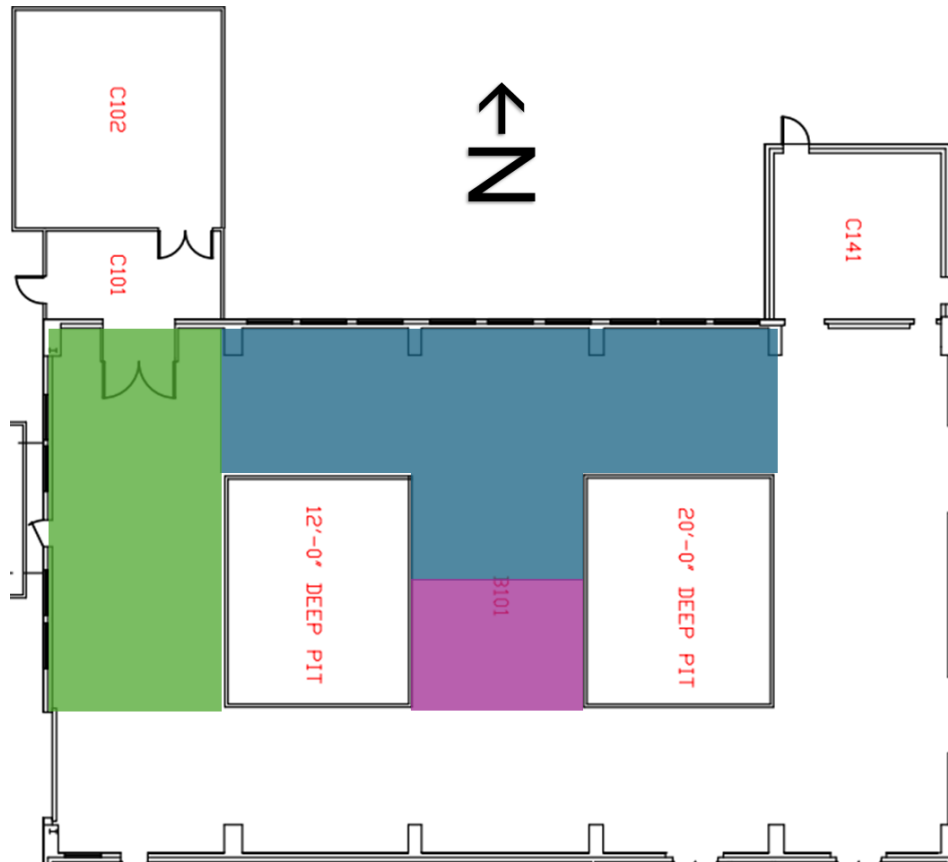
High Bay Floor Plan. Original Platform (blue), South Extension (purple) and West Extension (green).
